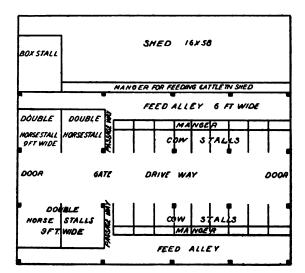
PLAN FOR A SMALL BARN (GROUND FLOOR.)
